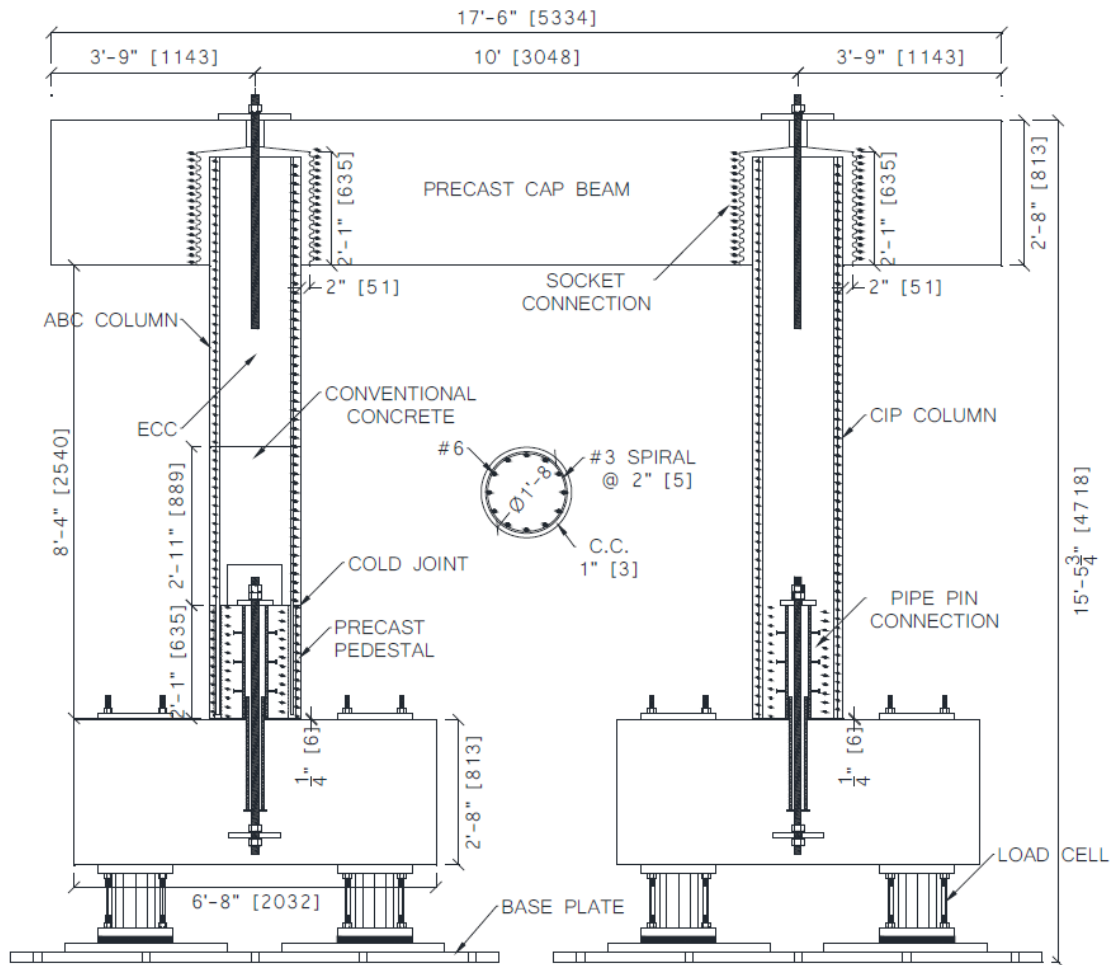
Two Pier Bent Specimen (courtesy of Mehrsoroush and Saiidi 2014)
